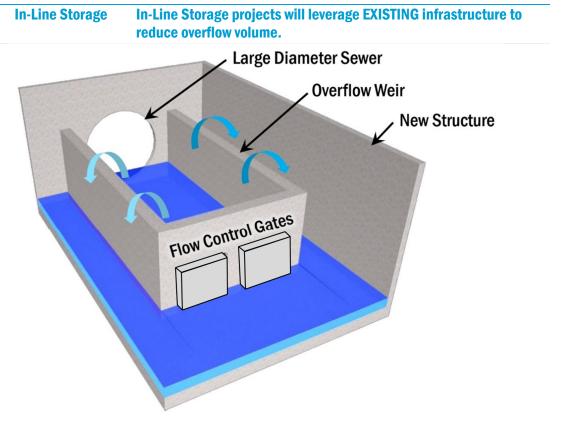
Example In-Line Storage Control Structure Project (Xylem)
